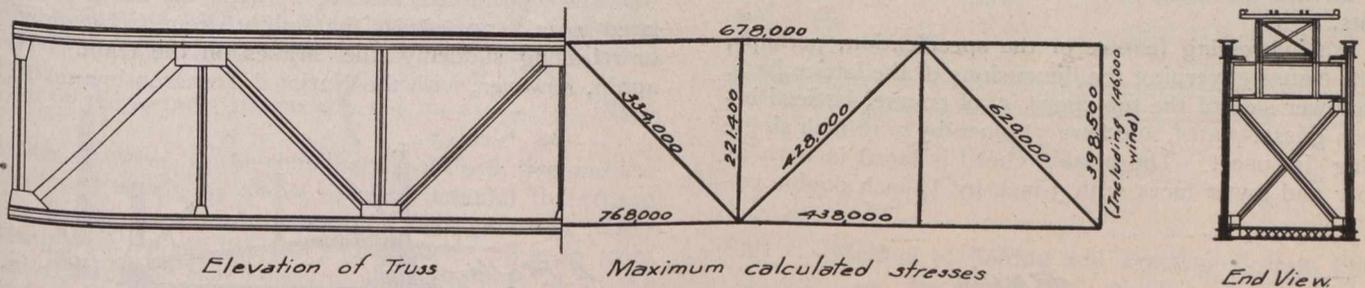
The 150-Foot Span Truss and Maximum Stresses.
